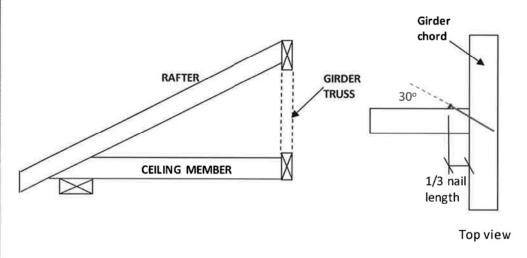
Toe-Nailing Rafter / Ceiling Member to Girder Truss
